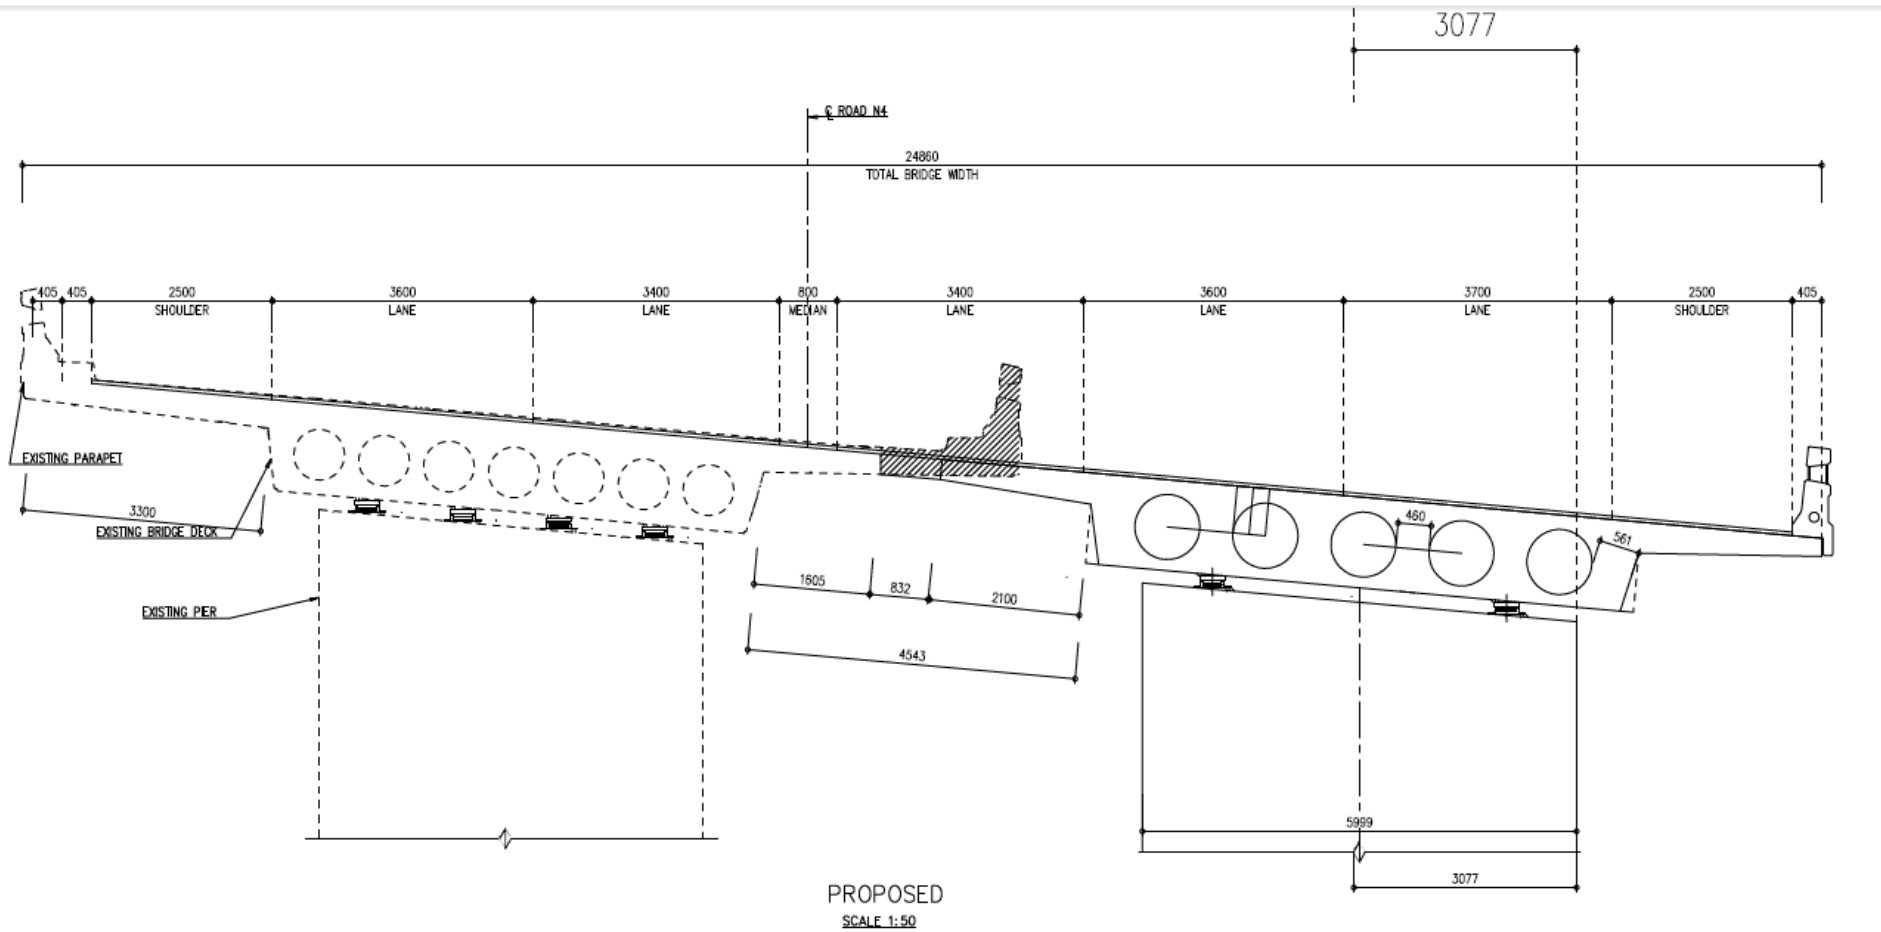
Proposed Crocodile Bridge Structures Plan
